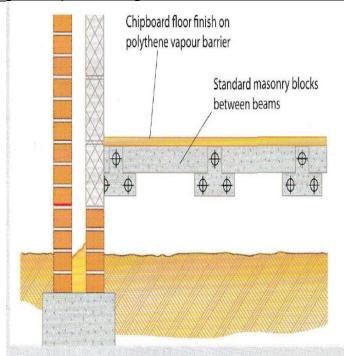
A beam-and-block ground floor. The wall below the DPC, often includes an airbrick. This ventilates the empty space below the suspended floor.
